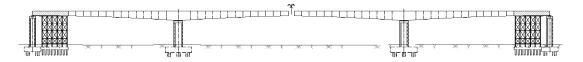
Superstructure Installation by Balanced Cantilever Method-2
